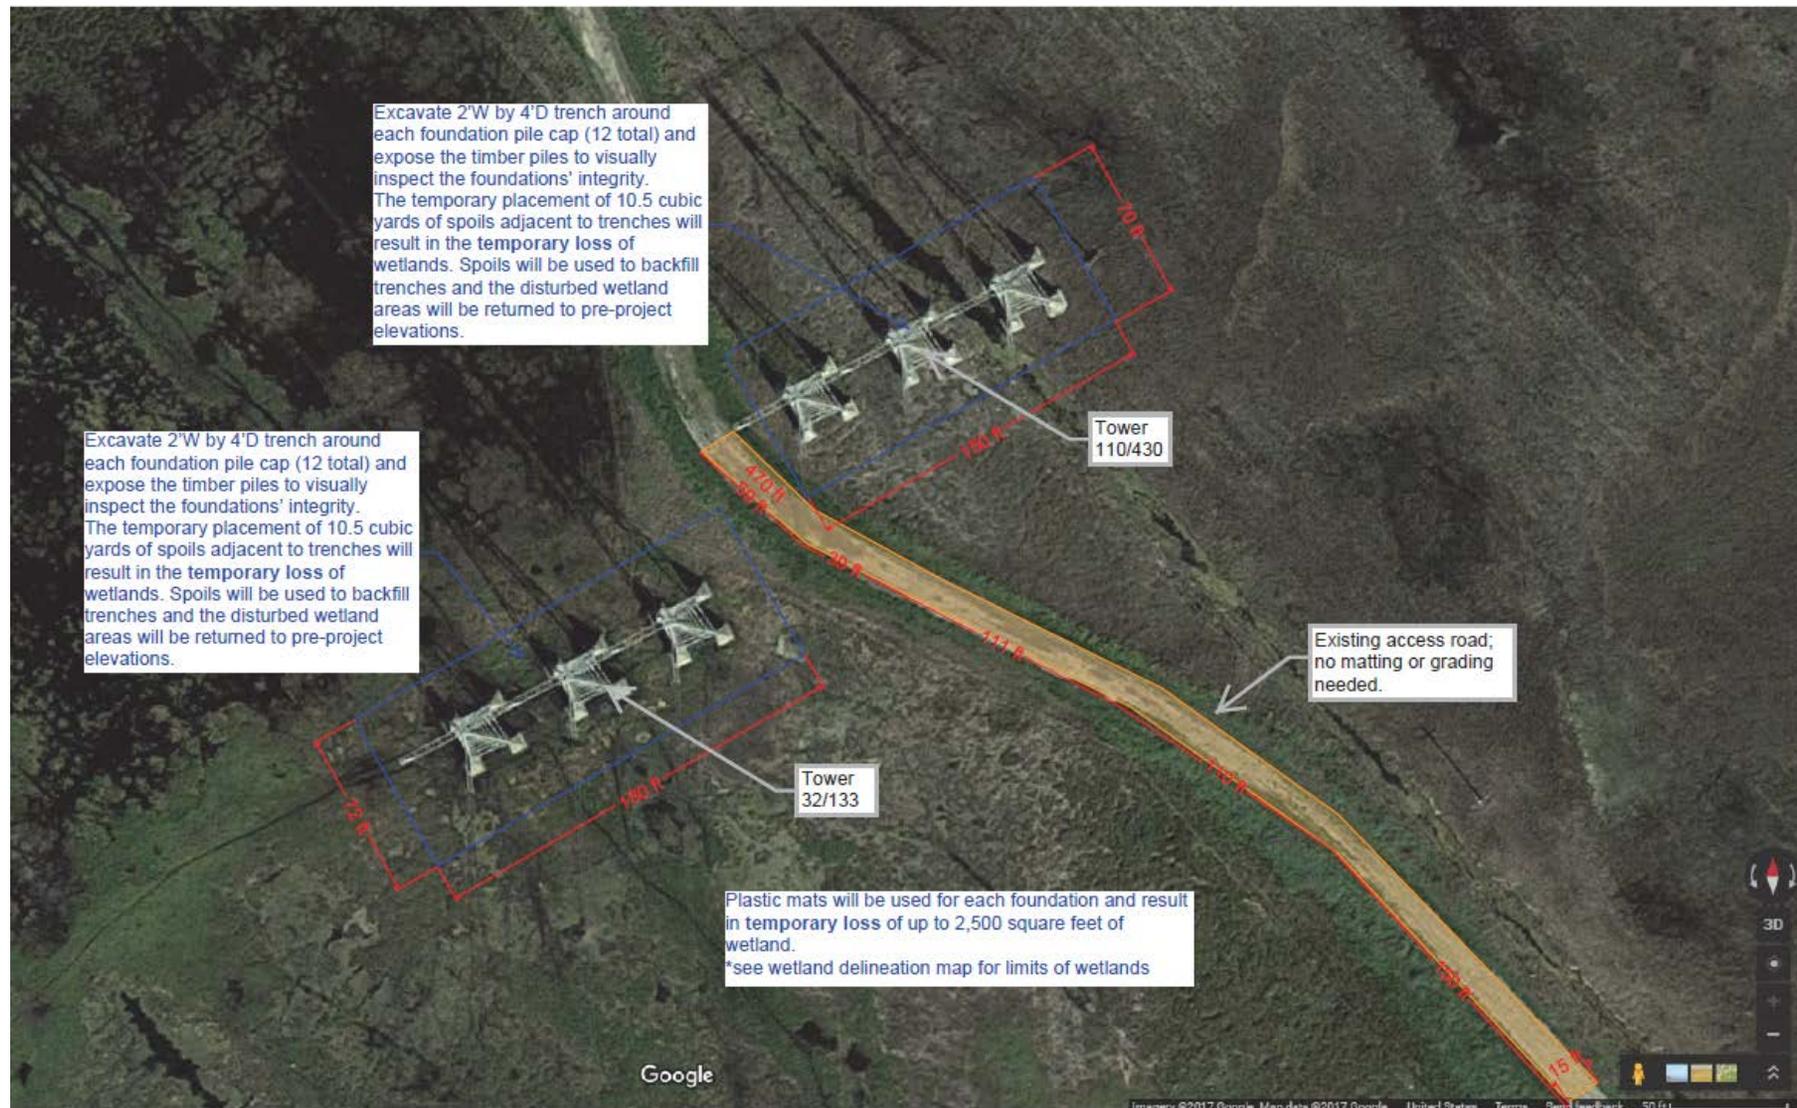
Footing Inspection Area - Towers 33/133 and 110/430
